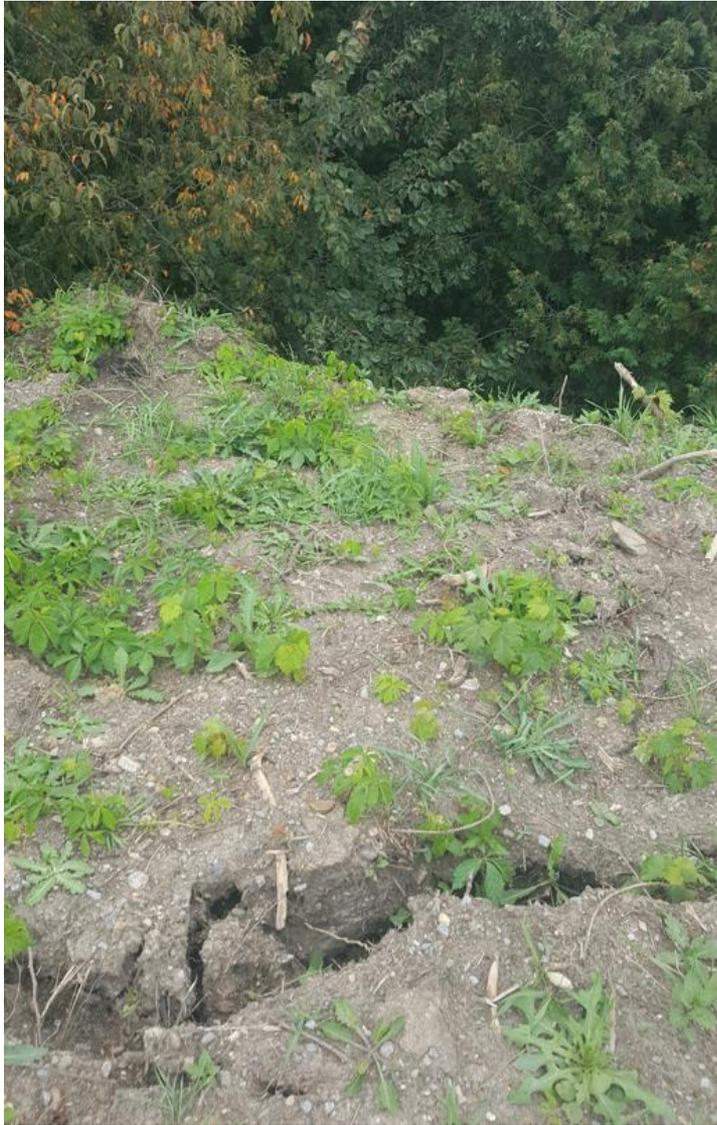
View of slope looking northeast from the location of BH101-21 at corner of Indacom Drive.
